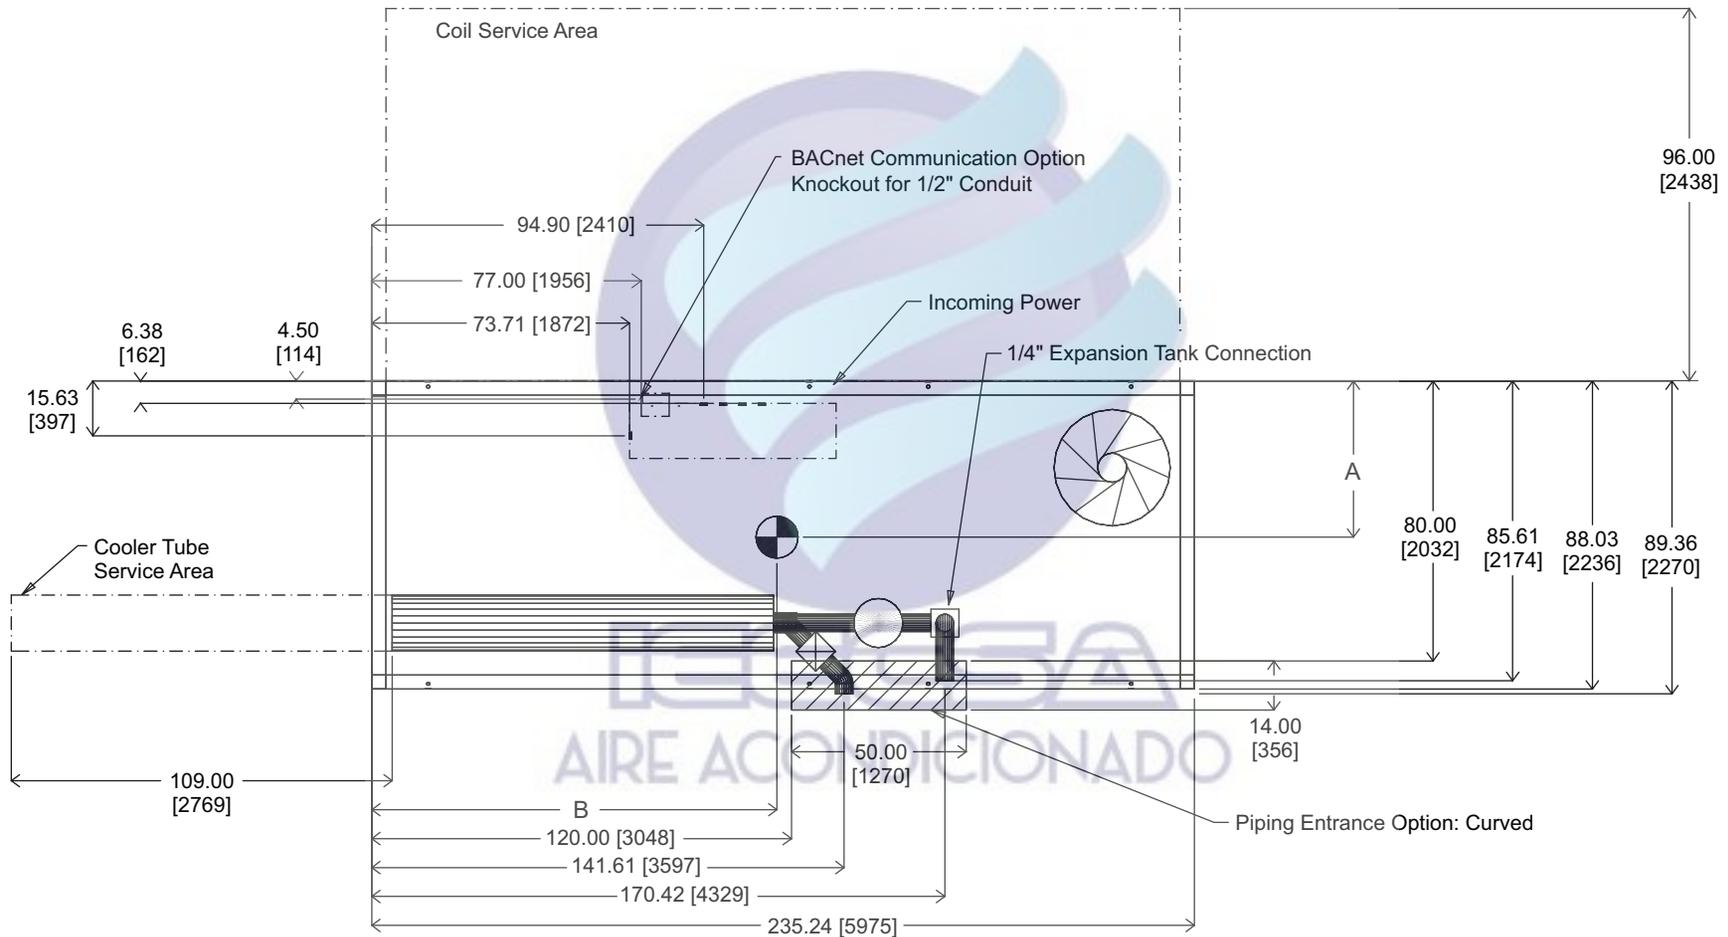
30XA140,160 Air-Cooled Liquid Chiller Dimensions without Pump (cont)
